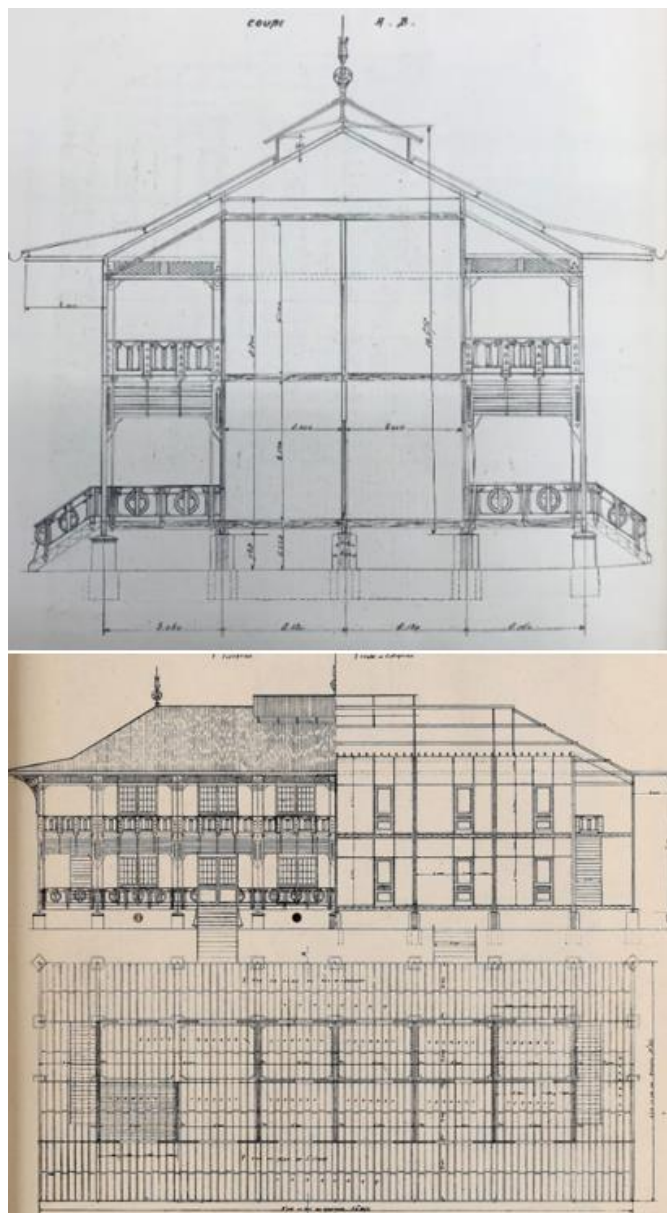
elevations (transverse and longitudinal) and plan view (ground floor and upper floor) of the former ABC Hotel in Thysville (now the Palais de Justice in Mbanza-Ngungu) (source: Goffin, 1907).
